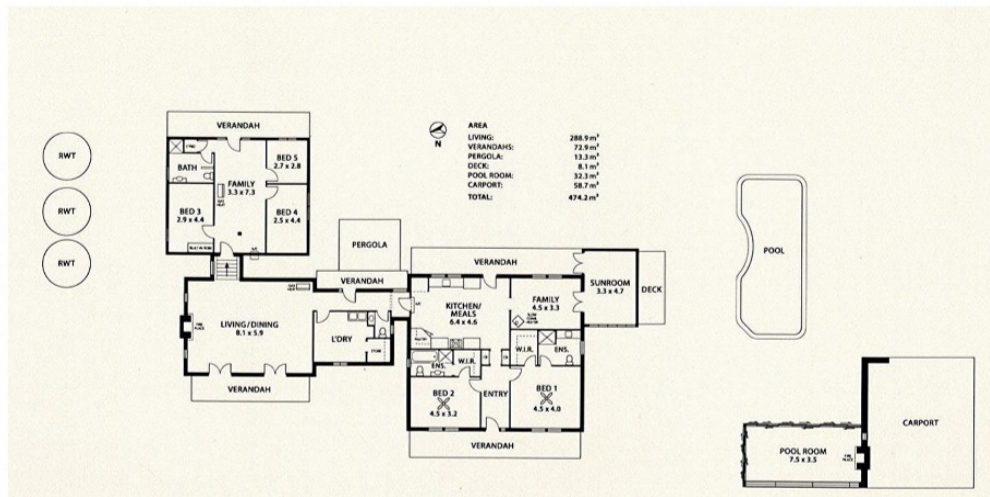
Floor plan of the house and immediate outbuildings, no changes are proposed
